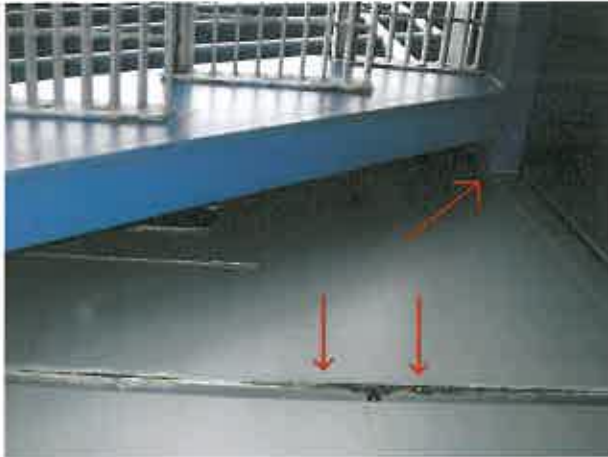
Exterior stair structural penetration at cladding and corrosion on bottom of cladding panel directly below penetration
